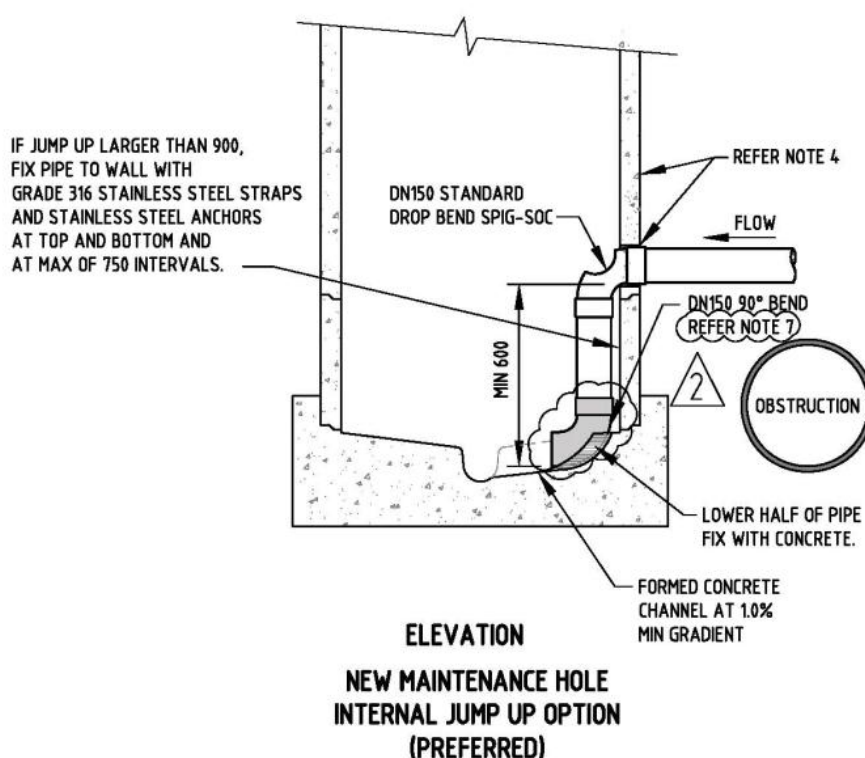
Gravity main jump up arrangement (SCM Section 5, drawing 4005-20005-08)
